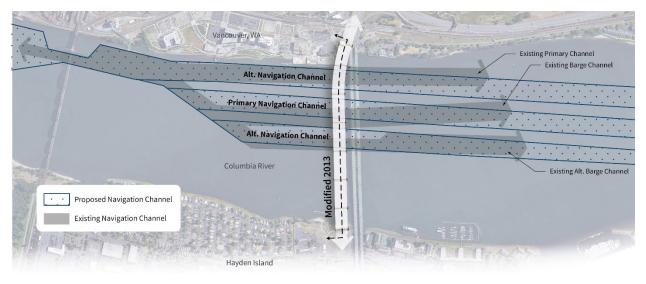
Conceptual Bridge Plan: Fixed Span Bridge
